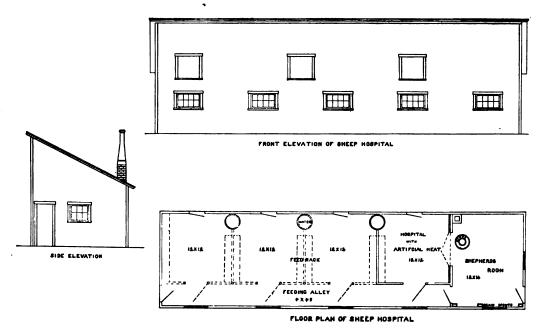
A GOOD LAMBING SHED (ELEVATIONS AND FLOOR PLAN).
